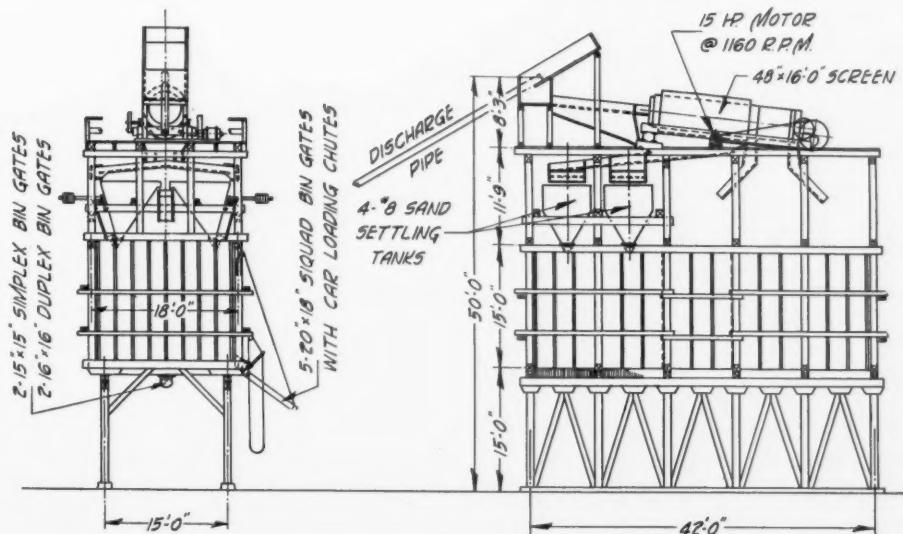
Side view and elevation of plant, same as shown in Fig. 10, using bins instead of ground storage
